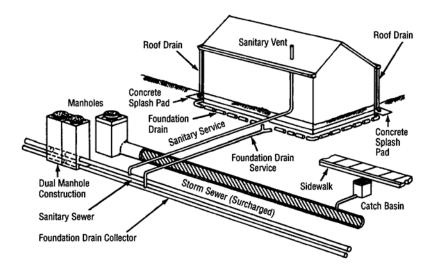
Example of third pipe system dedicated to collection of foundation drainage. (Source: *Modern Sewer Design*, Fourth Edition 1999, American Iron and Steel Institute)
